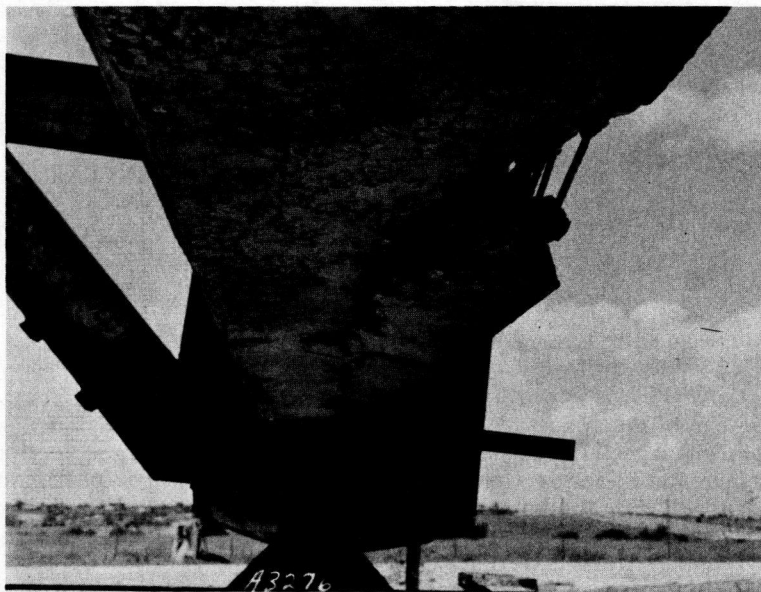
Beam failure, torsion test, pretensioned beam.
